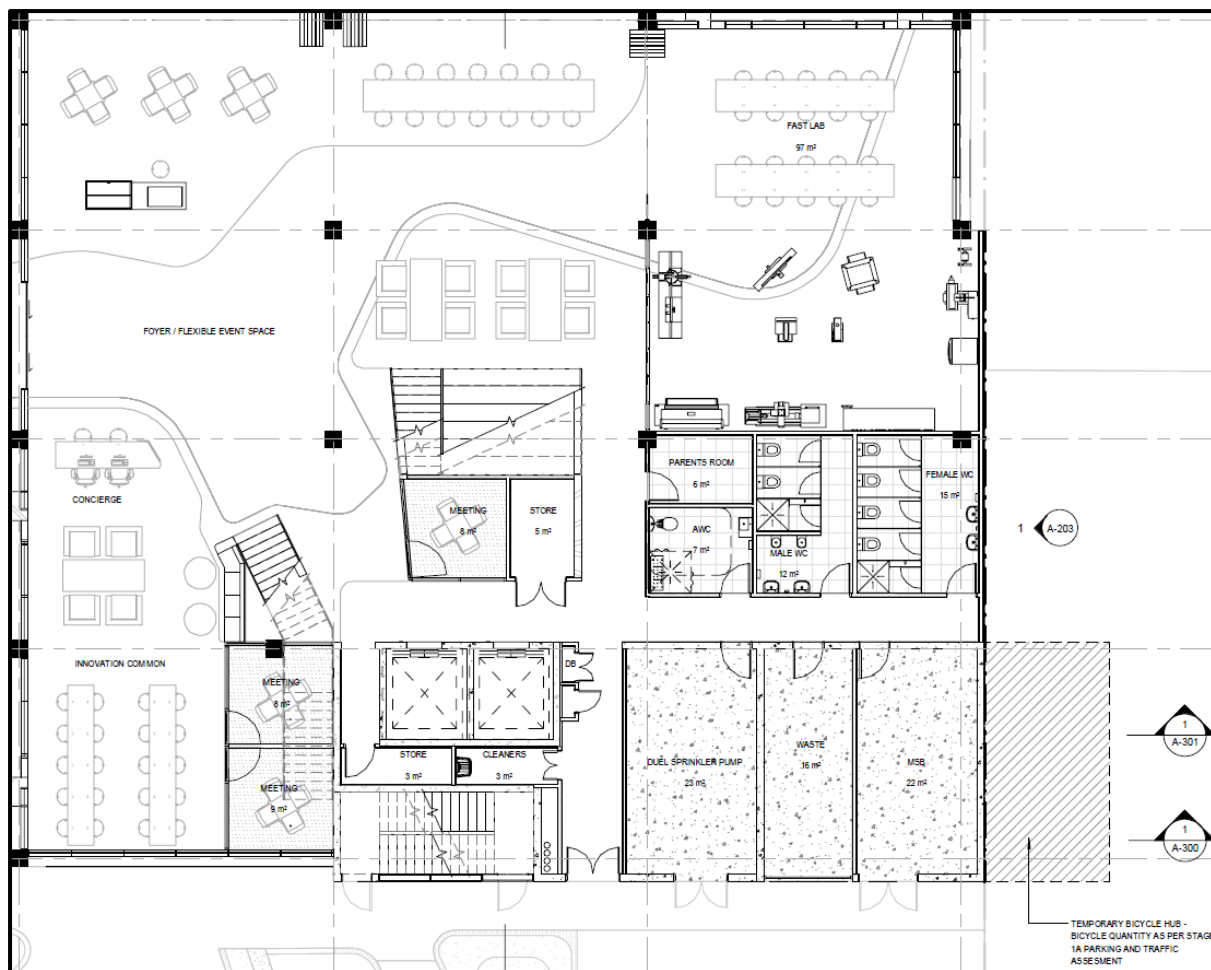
Ground floor plan showing location of showers and bicycle hub
